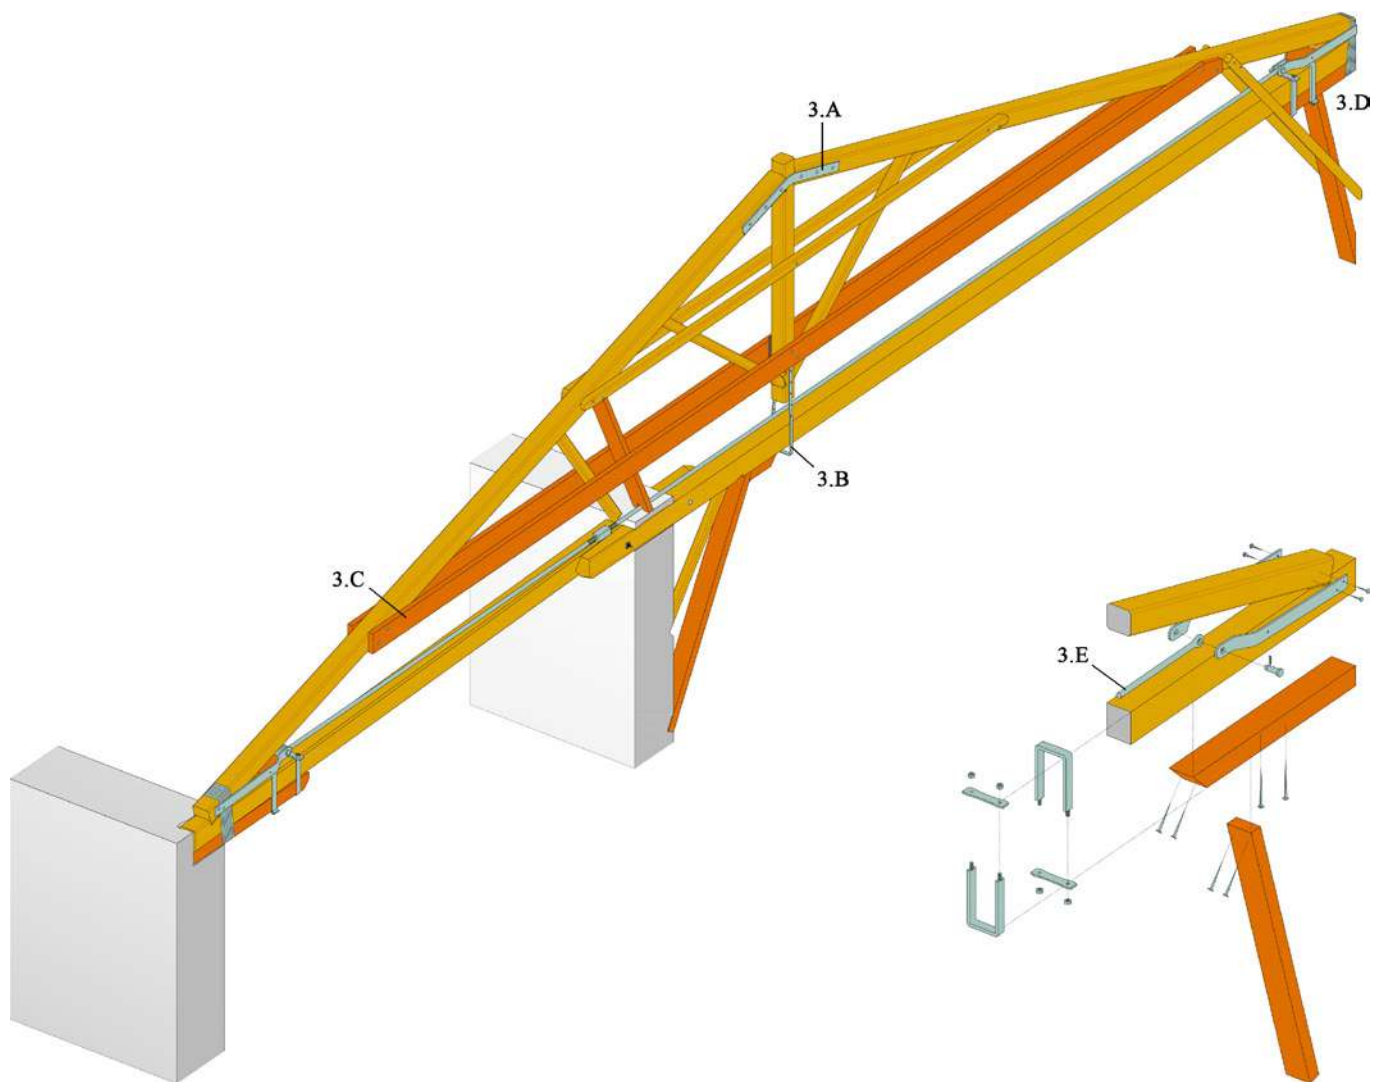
Scheme of trusses 1-10 (Fig. 1) with wrought iron and timber reinforcements. The joint between tie-beam and rafter was reinforced by a timber bracket, connected to the tie-beam by nails and a couple of iron fasteners. A thin iron strip was used to wrap together bracket and rafter.
